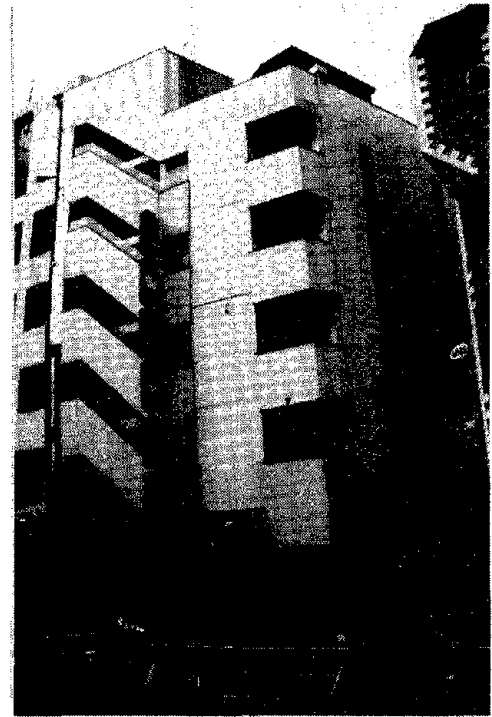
View of a damaged, six-story, steel moment-frame building
